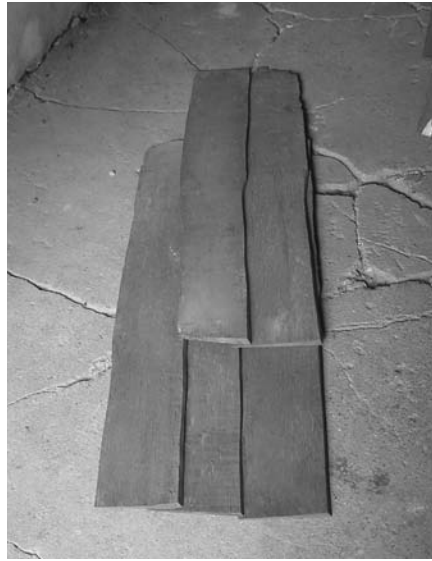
Five side-lap shingles found in the Dunkard Meeting House in Pricetown, Pennsylvania, built about 1777. These shingles are red oak, 5 to 5½ inches wide, 34 to 36 inches long, and ¾ to ⅝ inches thick. They were never installed and were found in a cupboard next to the kitchen fireplace. Some of their mates may have been used for kindling. These shingles are about 230 years old.
